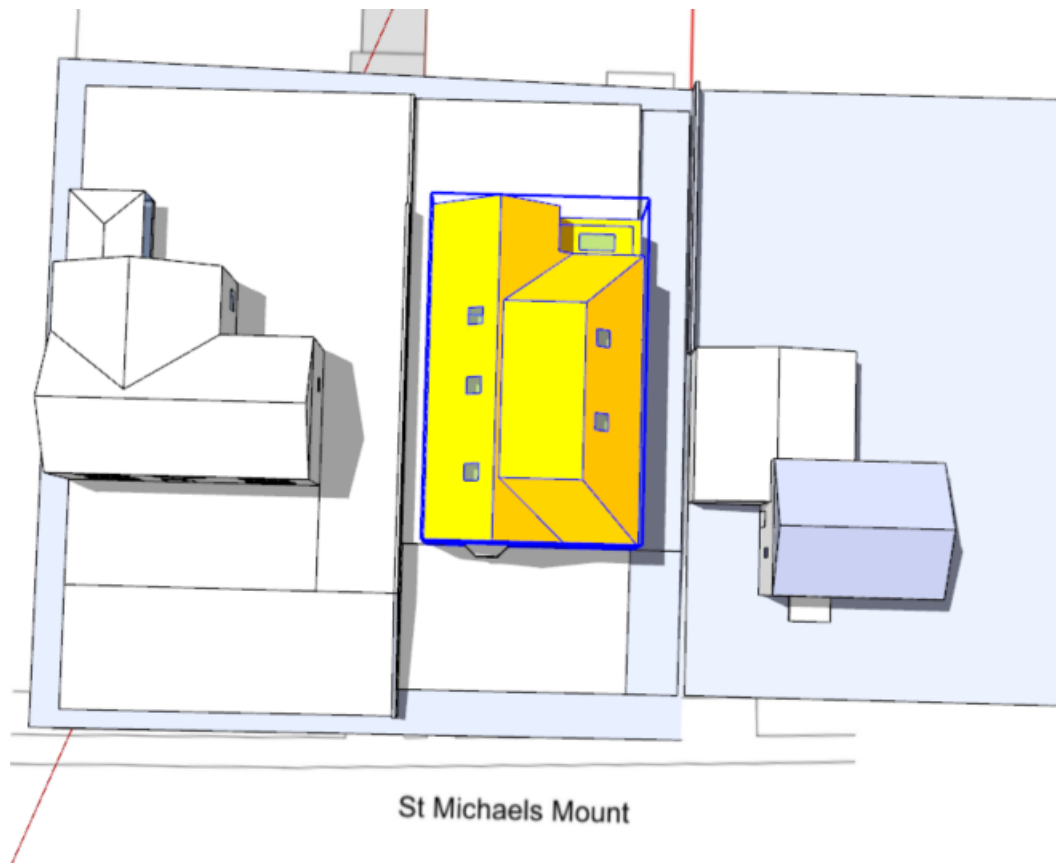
Proposed Building in yellow (image taken from sketch up model)
